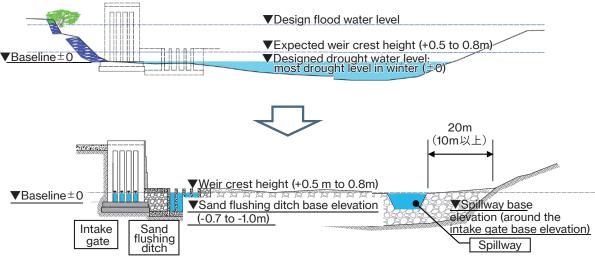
Cross-sectional Drawing of the Boulder Oblique Weir 2)
